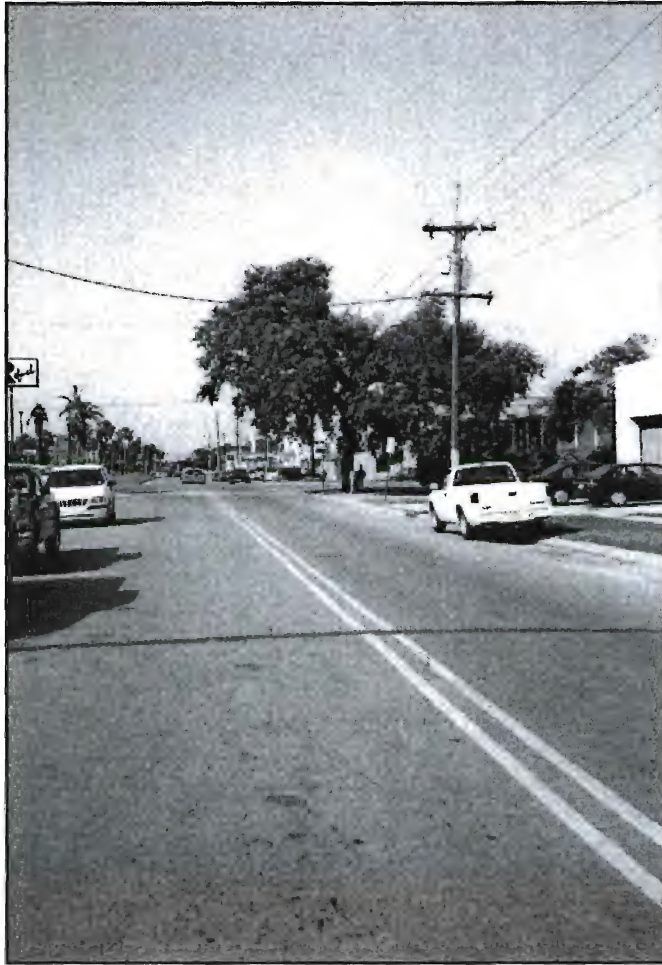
Photo depicts a streetscape of 1500 block of Jefferson Davis Parkway facing north.
